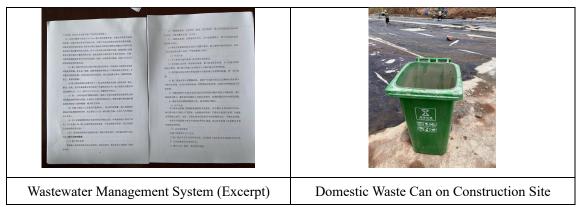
On-site Situation and Supporting Photos of Wastewater Management
